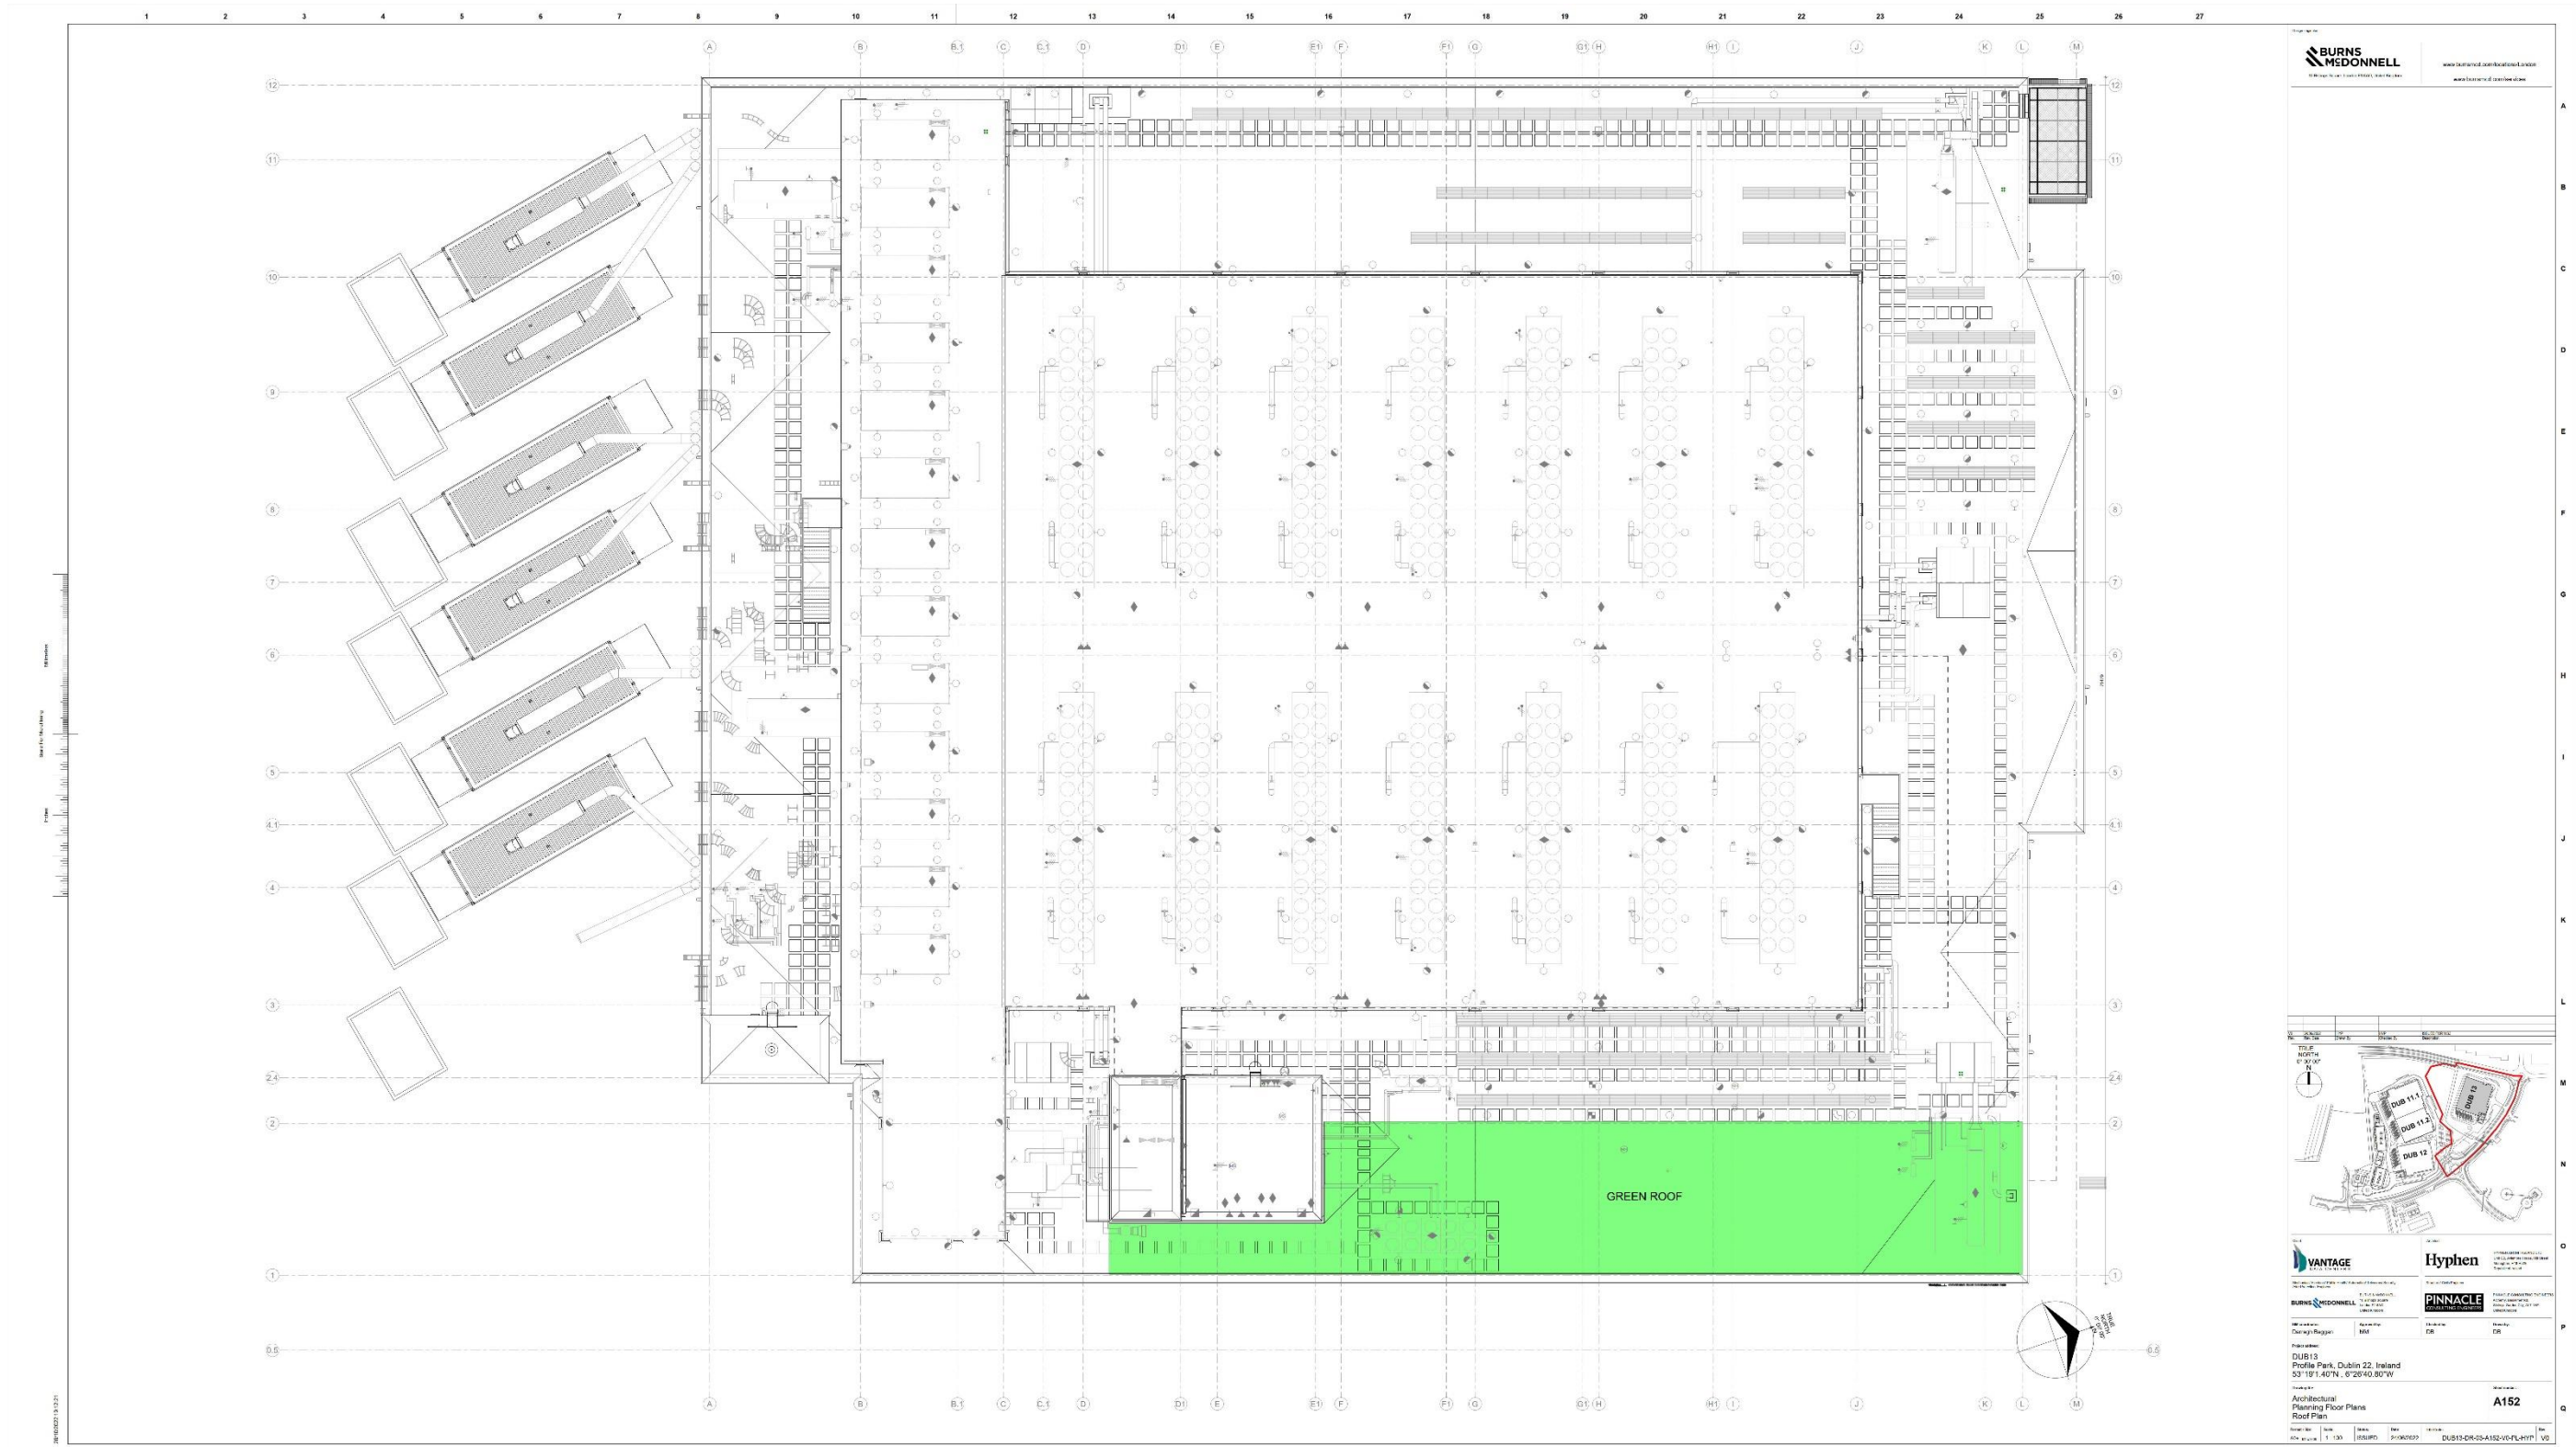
Proposed Roof General Arrangement Plan (Source Burns & McDonnell)
